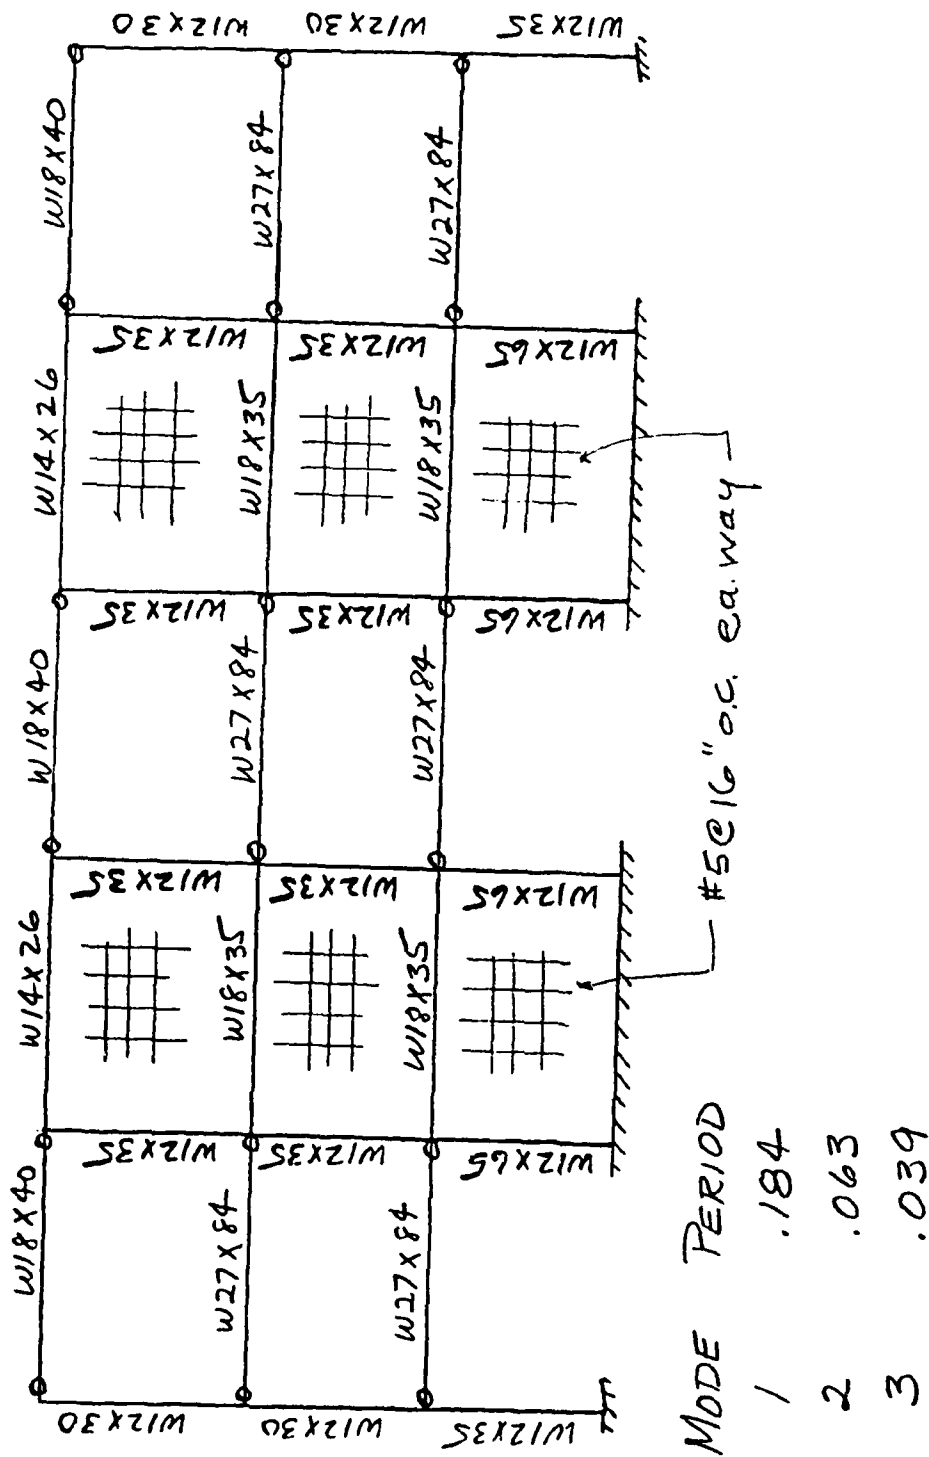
Shear wall frame, 0.10g base acceleration, 10-inch masonry.
